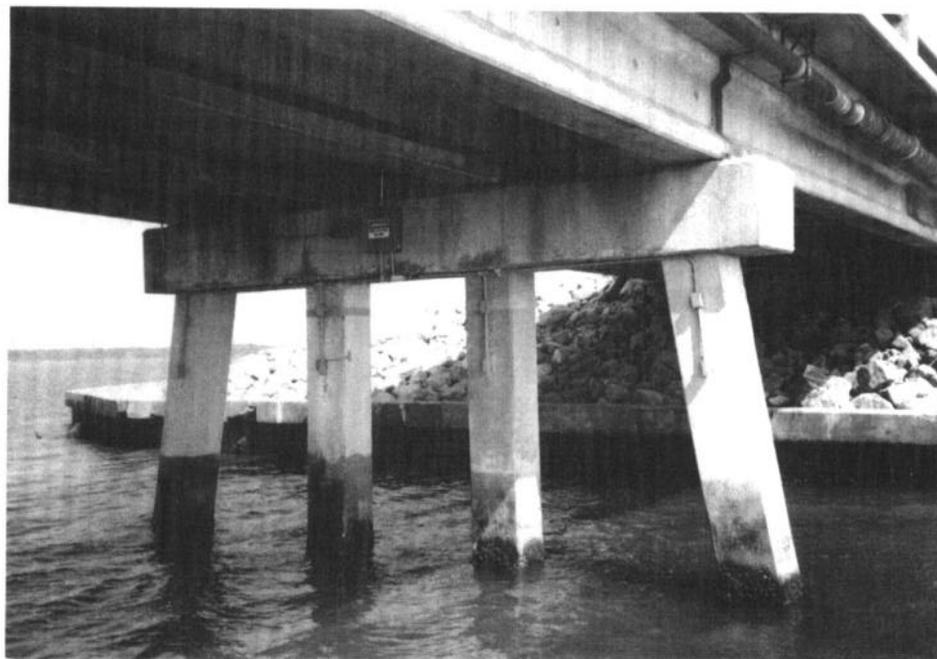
Completed island-side piles 1 yr after installation (test location #1).
